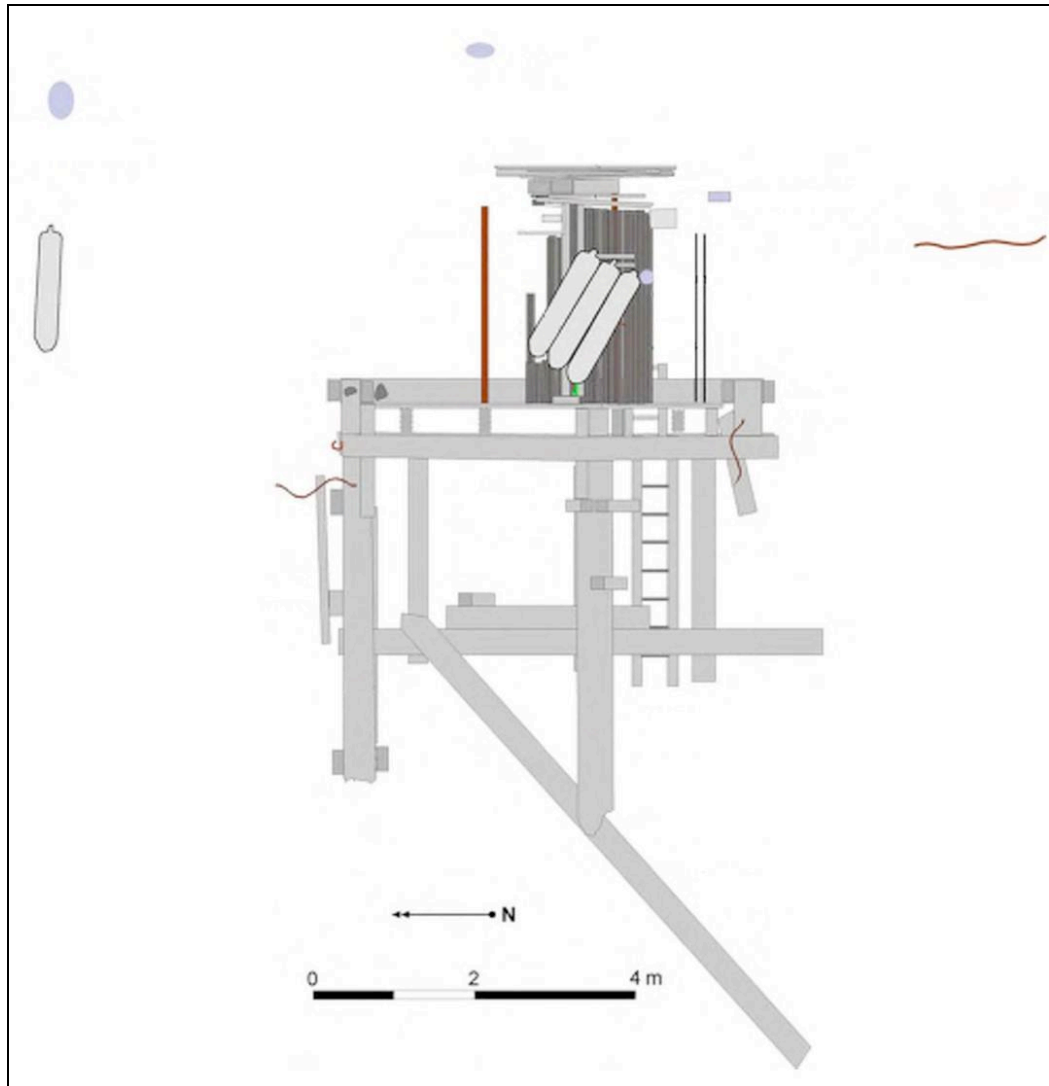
Site plan of the former Hovell Pile Light site excavation (amended from Coroneos & Raupp 2009, p. 28).
